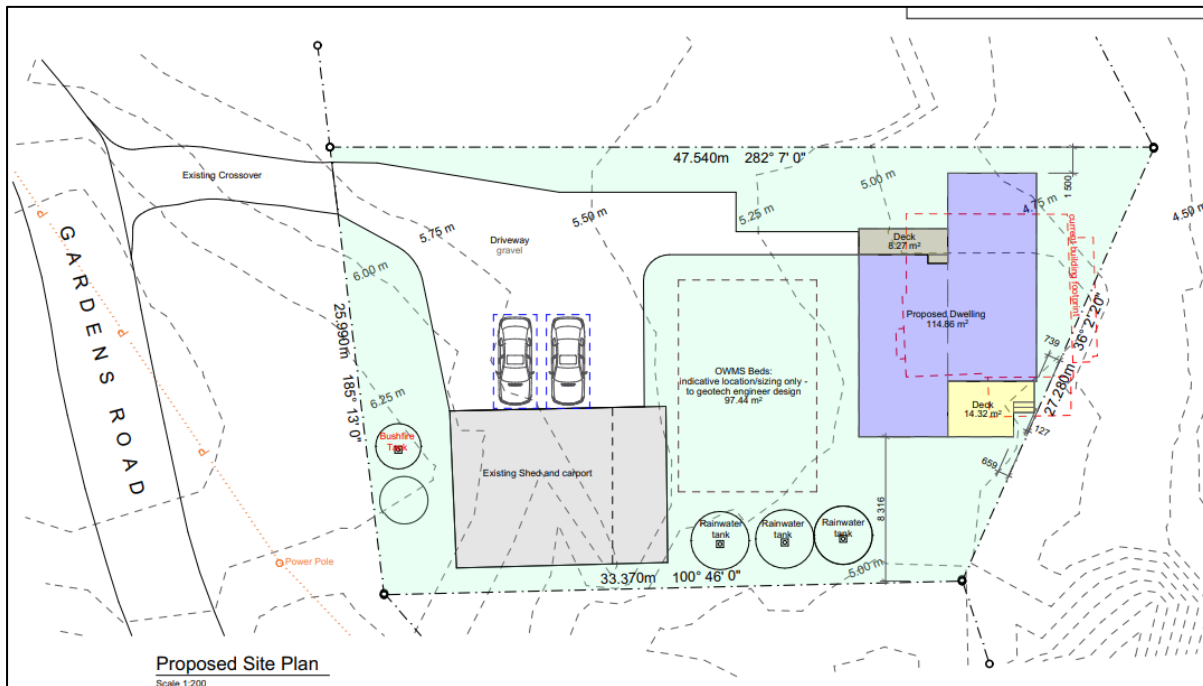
Proposed Site Plan (Source: Spectura Studio).
